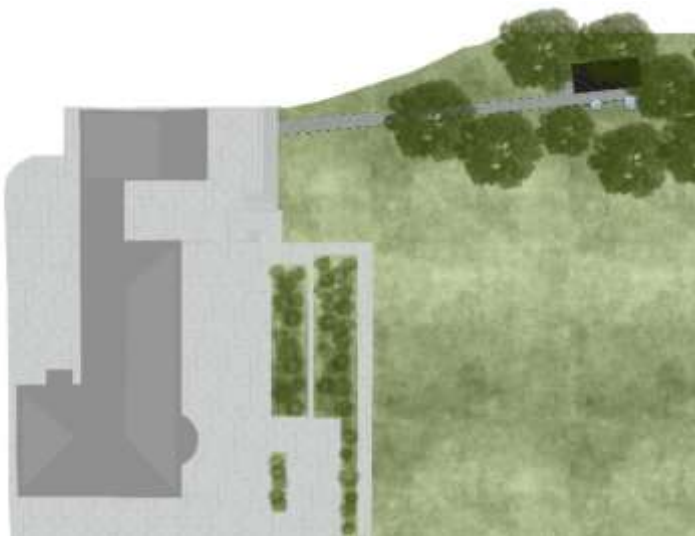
Top view of the site property and a section of the garden with the proposed shed.
